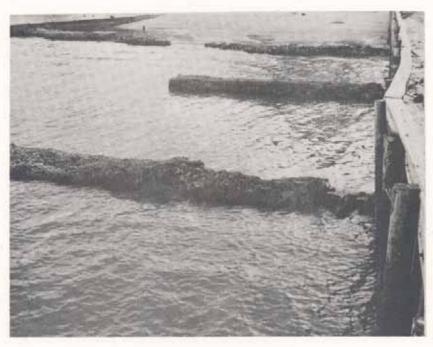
A. Herndon Spur Site, looking west at spur and sill structures.
